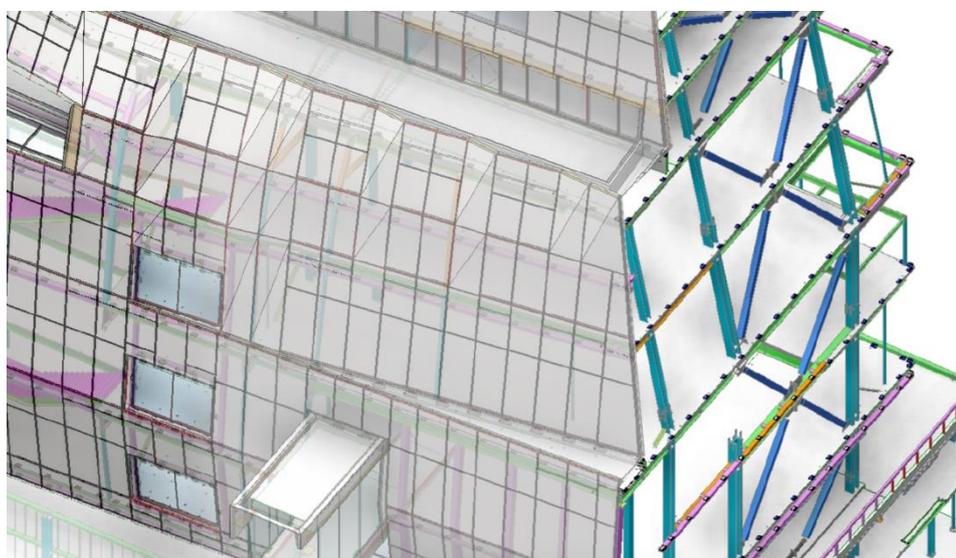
Overlay of curtainwall system coordinated with anchor locations on primary structural concrete and steel (Revit model with integrated IFC from steel fabricator).
